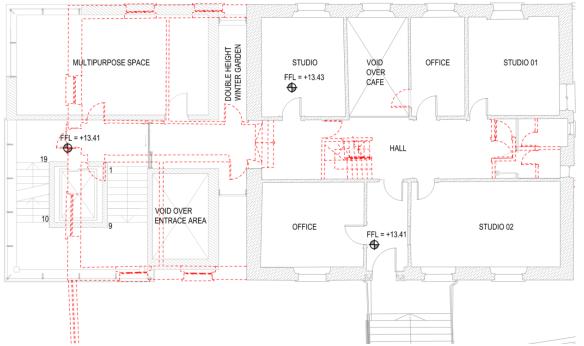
Proposed scheme (at first floor level) with dashed red lines indicating Extents of Demolition (Structural walls denoted grey)
